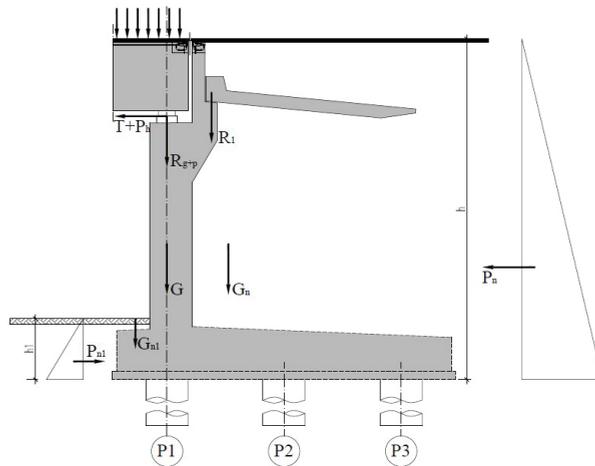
Forces acting on the abutment when the load is on span bridge (by MJ)
